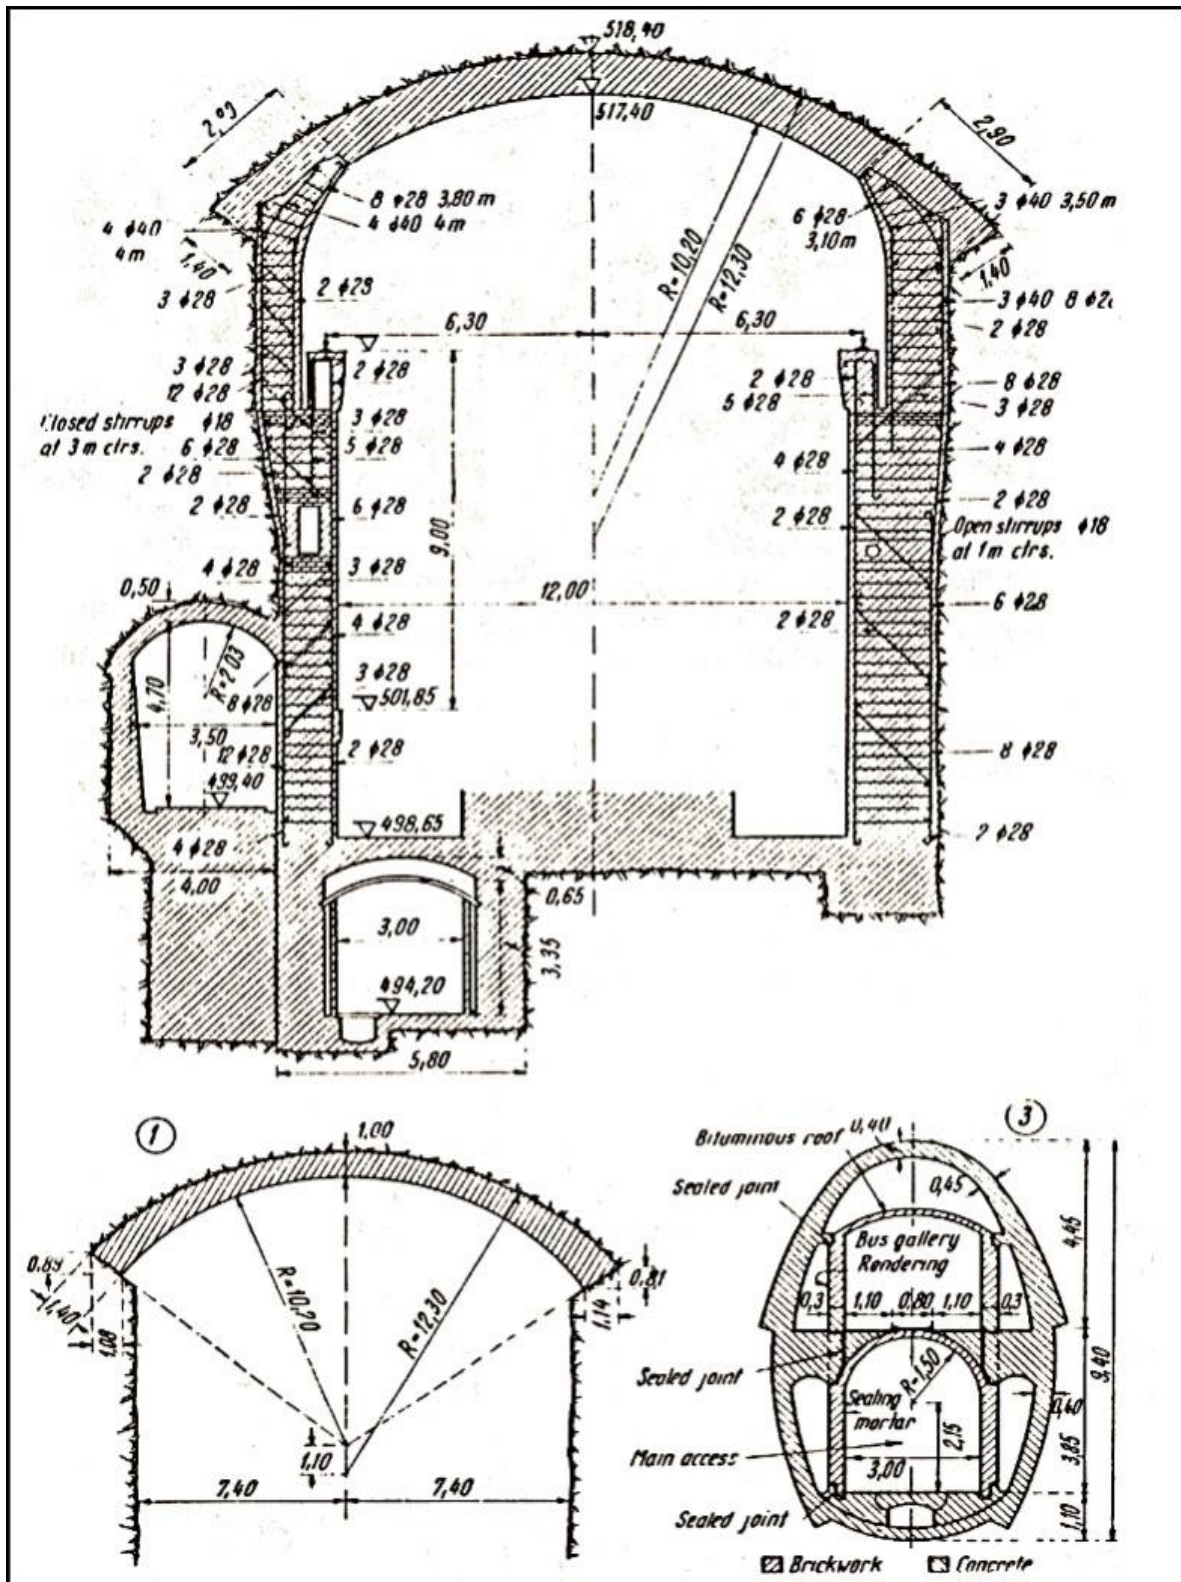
2 Section of a Powerhouse showing Thick Concrete Arch
